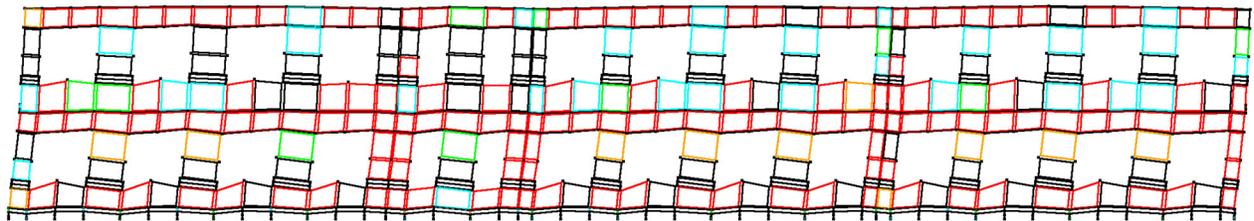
Nonlinear response of an isolated complex masonry wall elevation. The distributed failure shows damage (in red) to both piers and spandrels.
